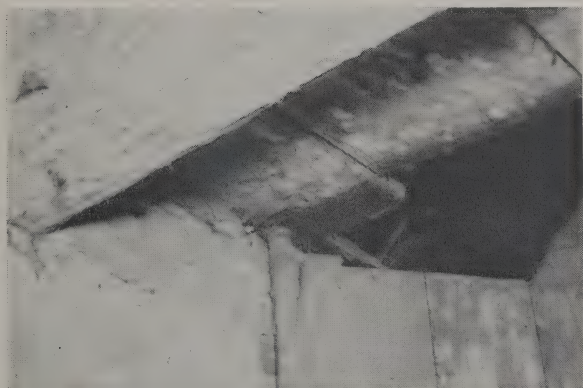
DETAILS OF STAIR CONSTRUCTION LEADING TO THE ATTIC
